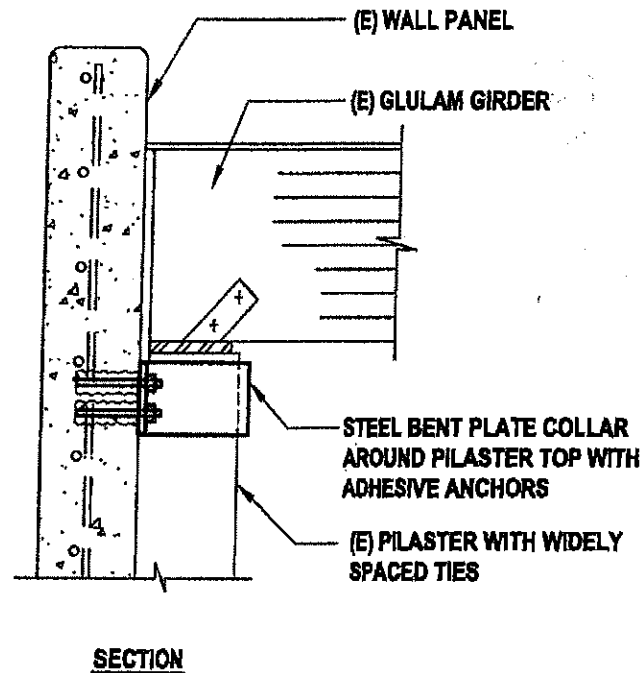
Enhanced Girder Connection – Collar at Pilaster
